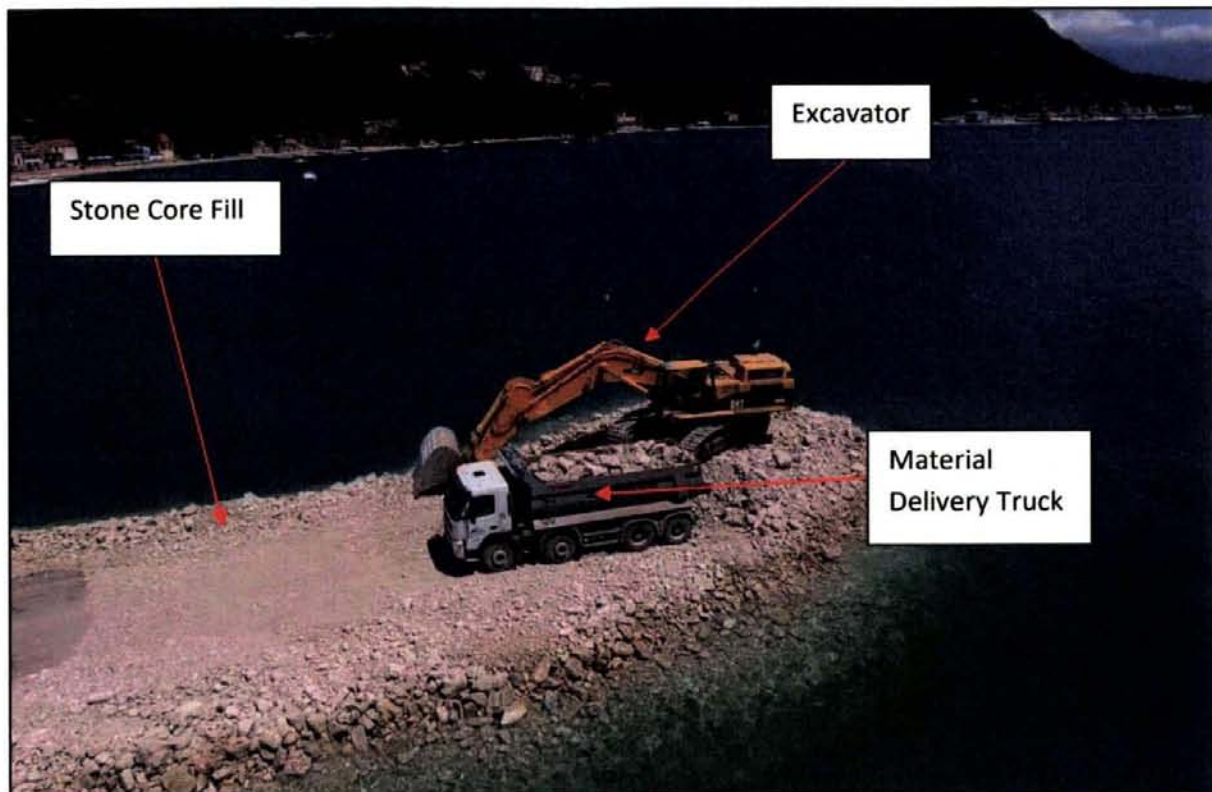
Shows typical operations for construction and embankment from land out into water.
